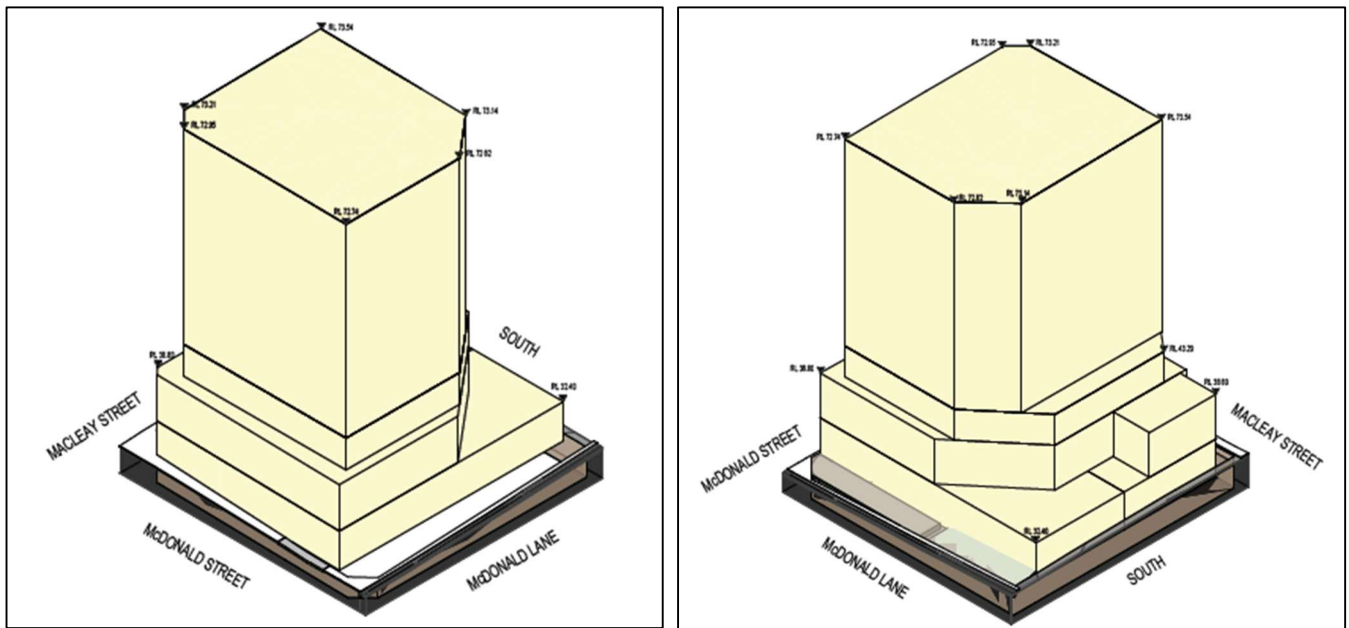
| Axonometric diagrams of the concept proposal as viewed from the northwest (left) and southwest (right) (Source: Applicant's EIS)
